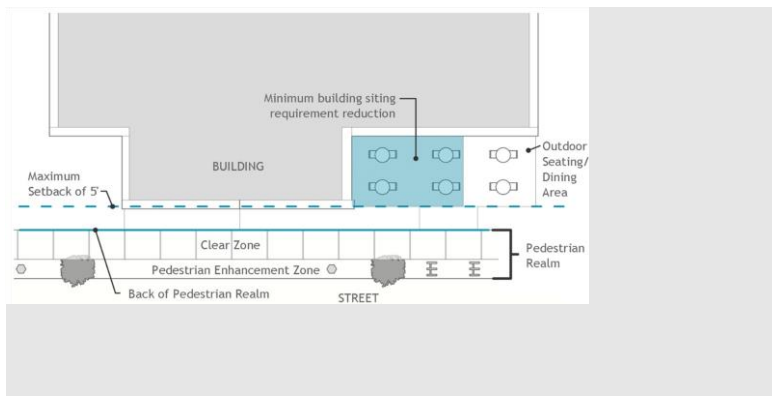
C: Minimum Frontage Requirements– Outdoor Seating and Dining
